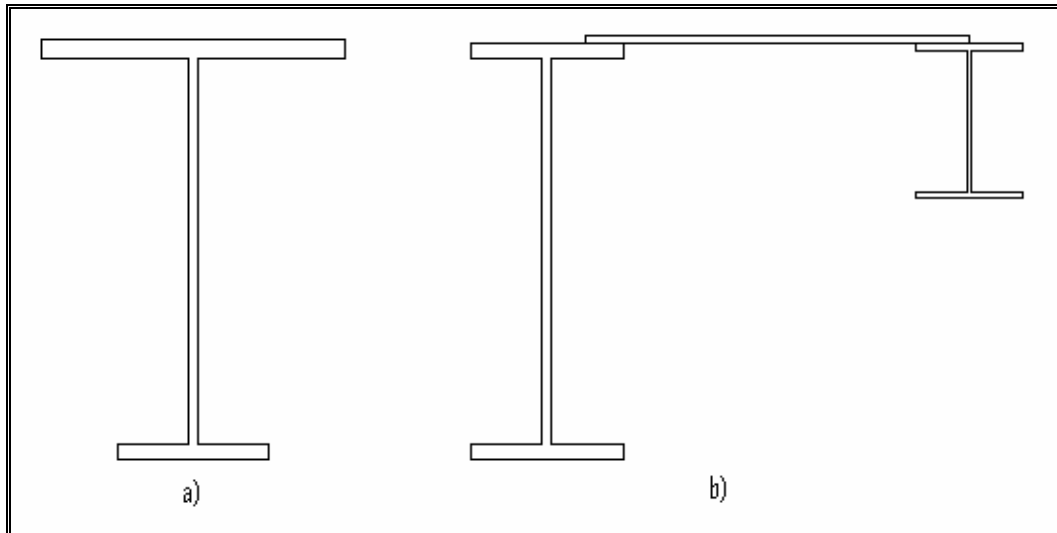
Illustration of a typical monosymmetric section; often used as a crane runway girder
